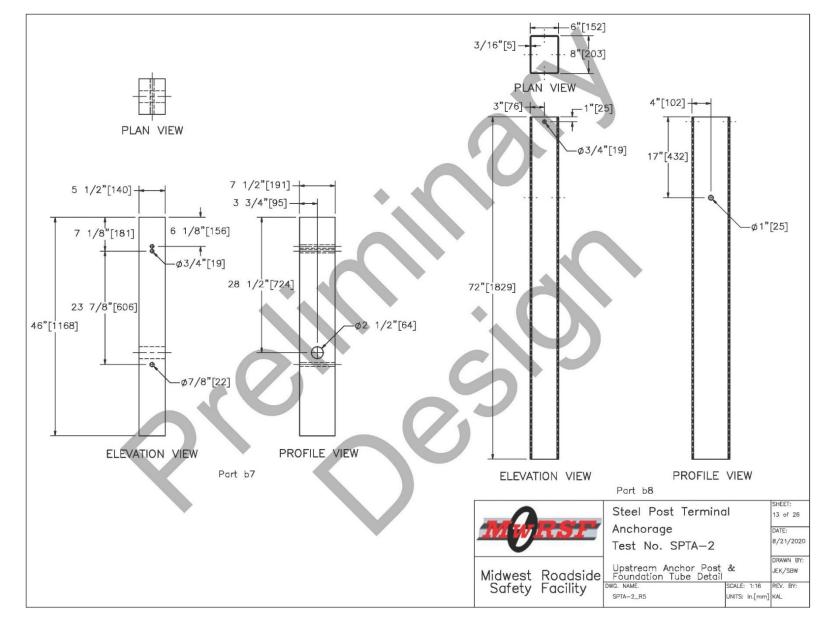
Upstream Anchor Post and Foundation Tube Detail, Test No SPTA-2
